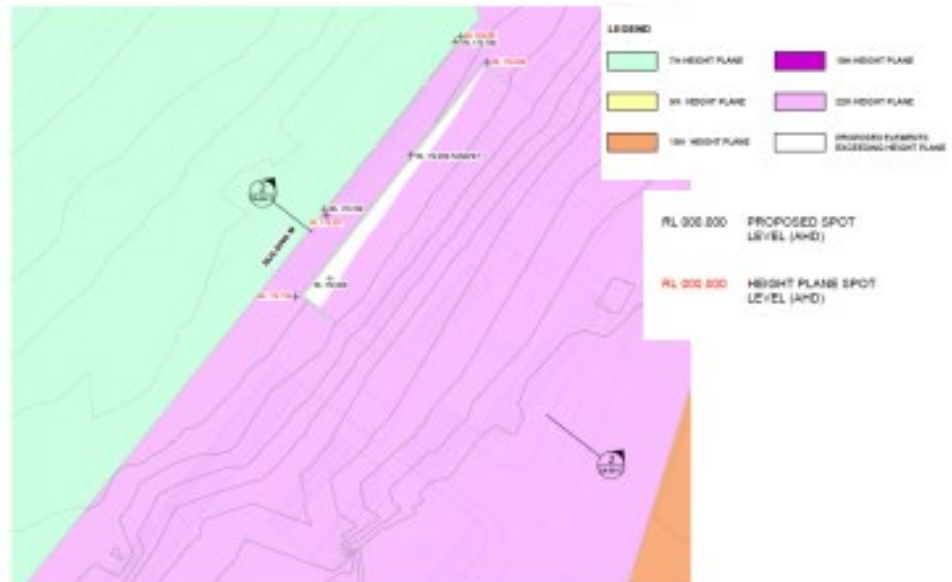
Height exceedance plan – Building M (Cox drawing DA-99-12)
